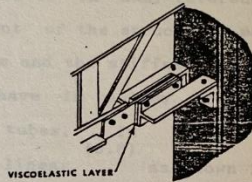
Use of damping material between perimeter, and flooring structures of World Trade Center.
